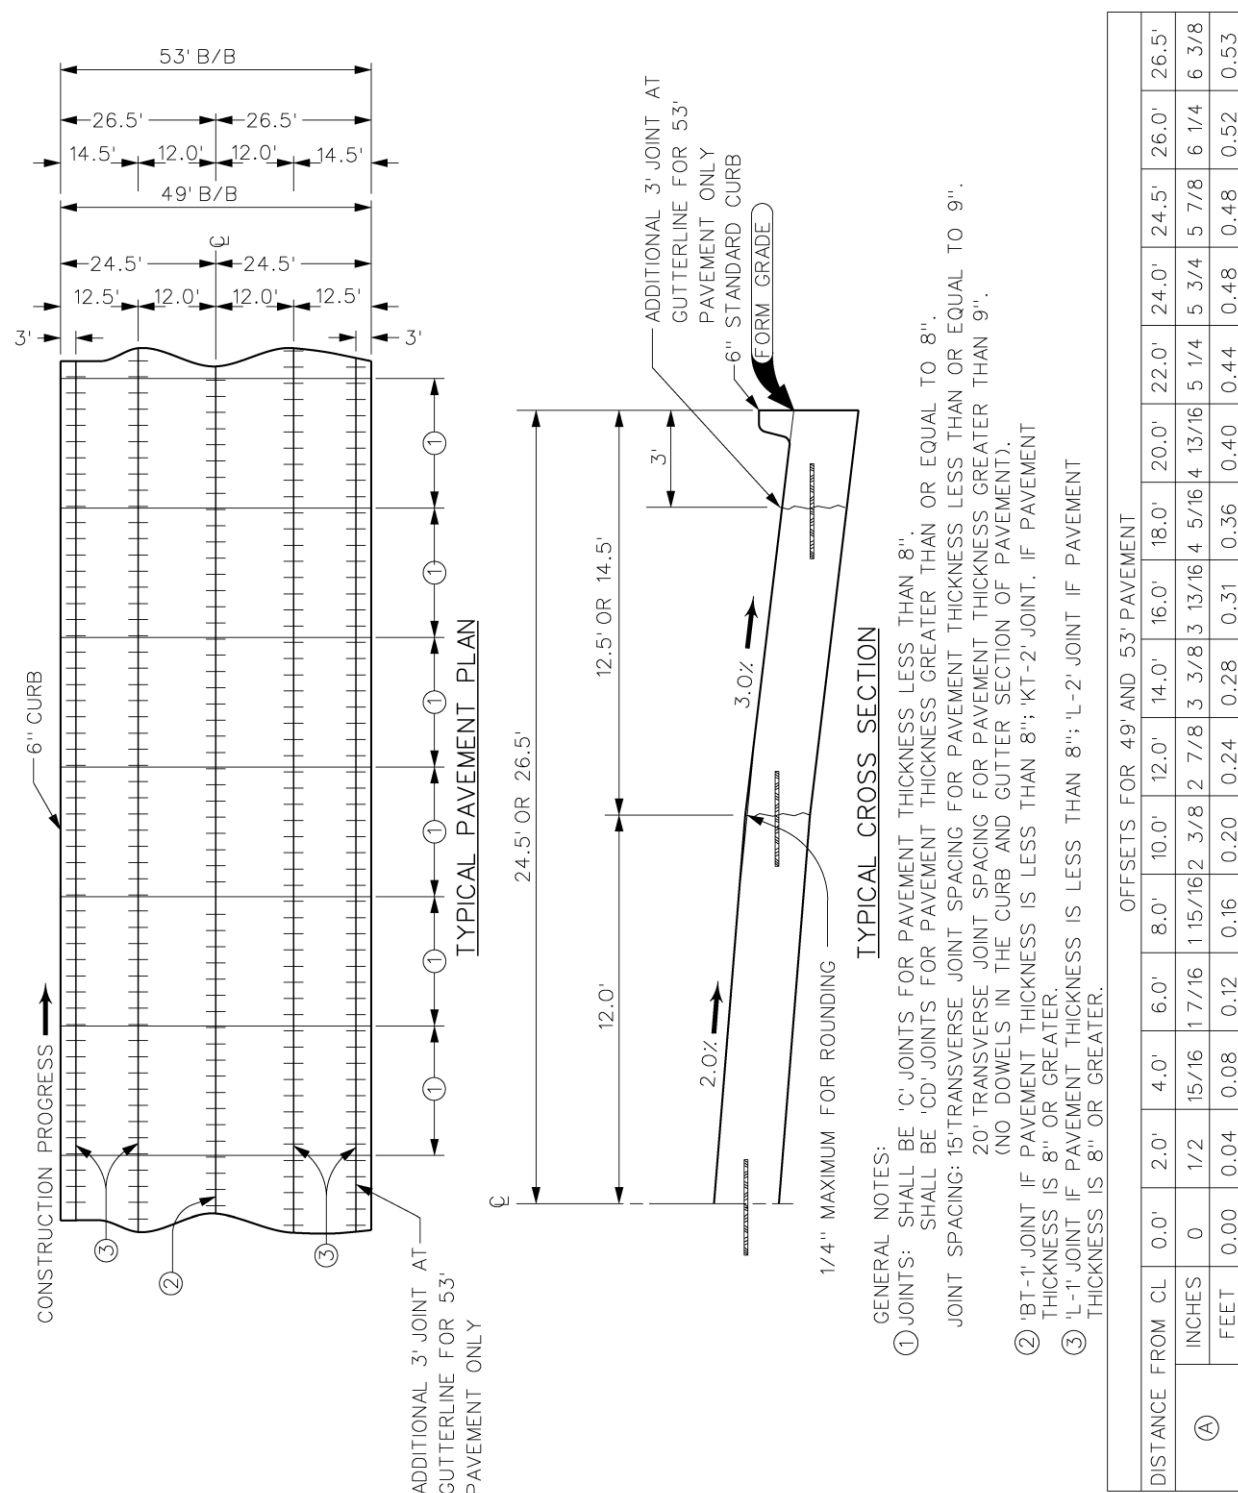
G-2.14: 49' B/B and 53' B/B C&G/HMA Pavement
